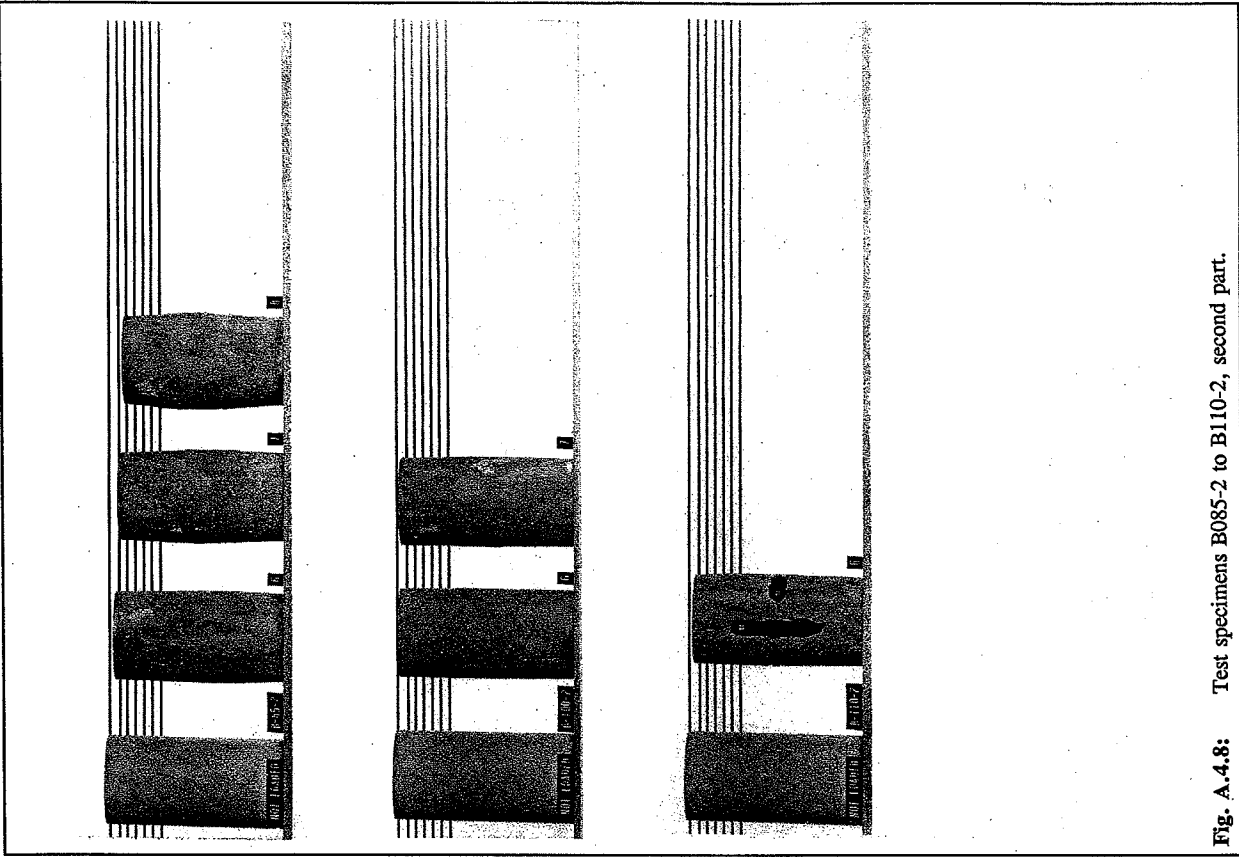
Test specimens B085-2 to B110-2, second part.
